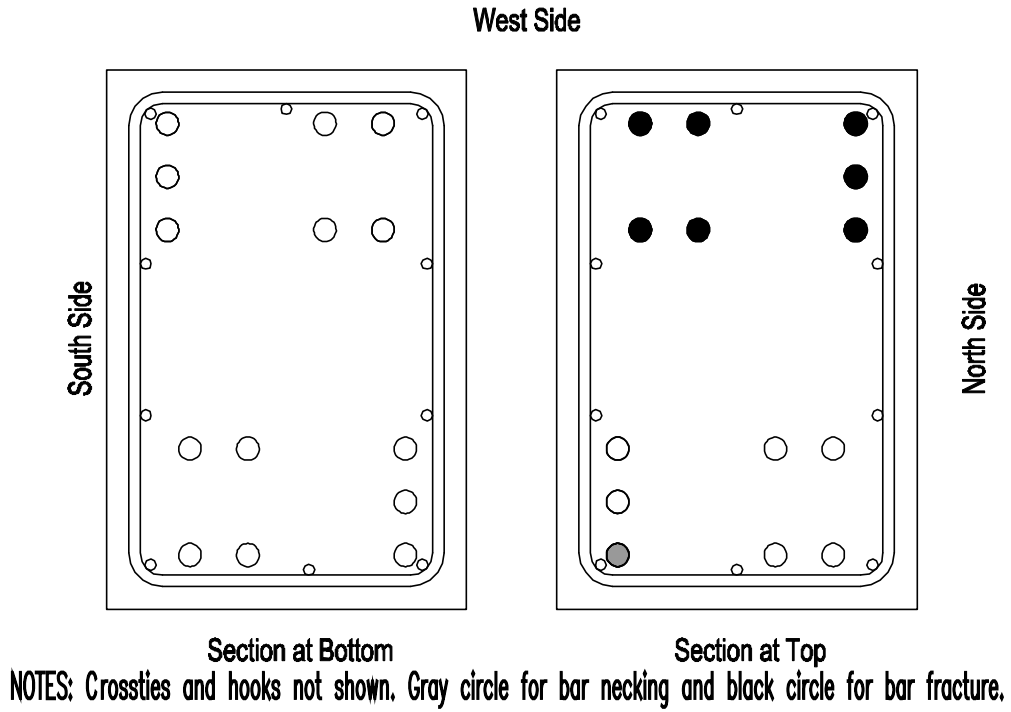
Reinforcing bar fracture locations, D100-2.5
